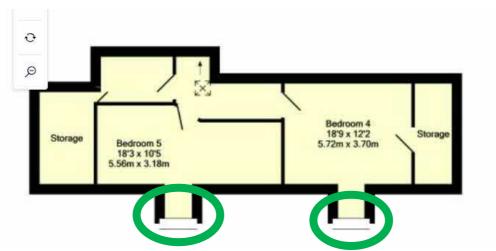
Plan of Second Floor/attic showing location of 2 x modern windows to be replaced [indicated by a green circle]
